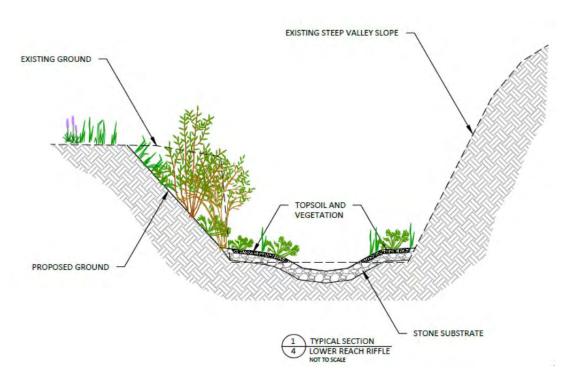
Detail of recommended grading and slope stabilization in lower reach.
